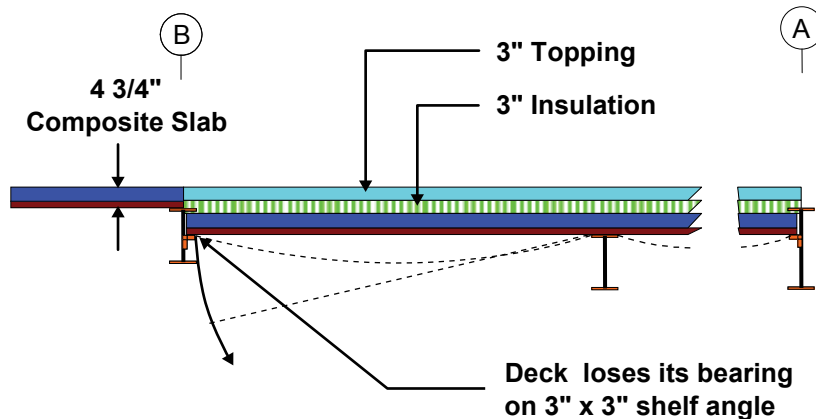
This metal deck collapsed while concrete for the topping was being placed over the newly-placed structural slab. Note also that depressing the structural slab to accommodate the insulation and topping slab introduced some constructability issues that affected the amount of bearing afforded to the metal deck.
